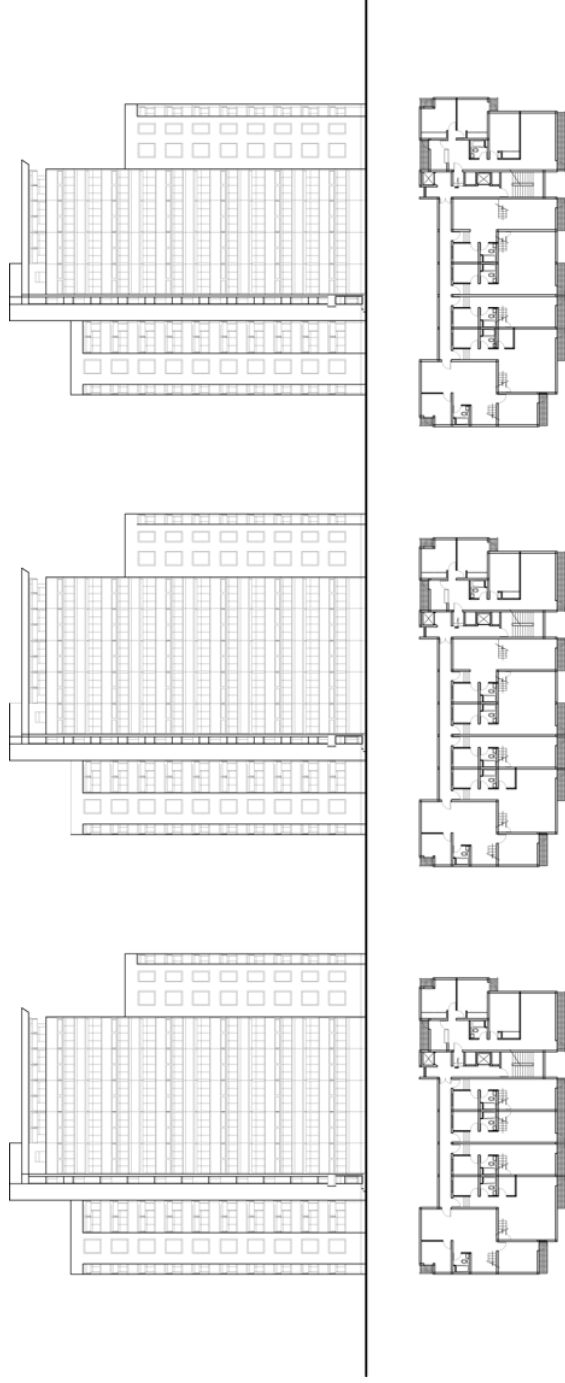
Architectural elevation and plans of final design for Shanghai Taidong Residential Quarter
